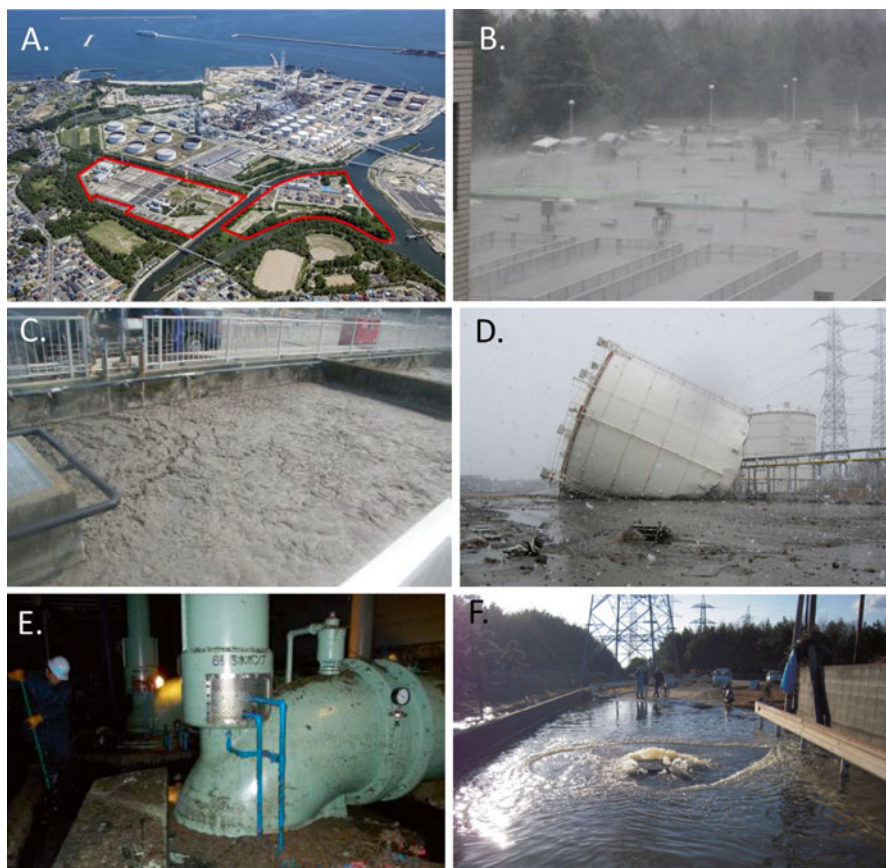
(a) Aerial photograph of the Sen-en Sewage Treatment Center before the tsunami. The delineated area indicates the site of the treatment plant. (b) Sewage treatment facilities being submerged by the tsunami on March 11, 2011. (c) Active sludge tank filled with tsunami deposits. (d) Damaged anaerobic sludge digestion tank overturned by the tsunami. (e) Submerged pump facility. (f) Untreated sewage spilling from sewers near the treatment center due to the pump's failure (Source: Miyagi Prefectural Government (permission granted for publication))
